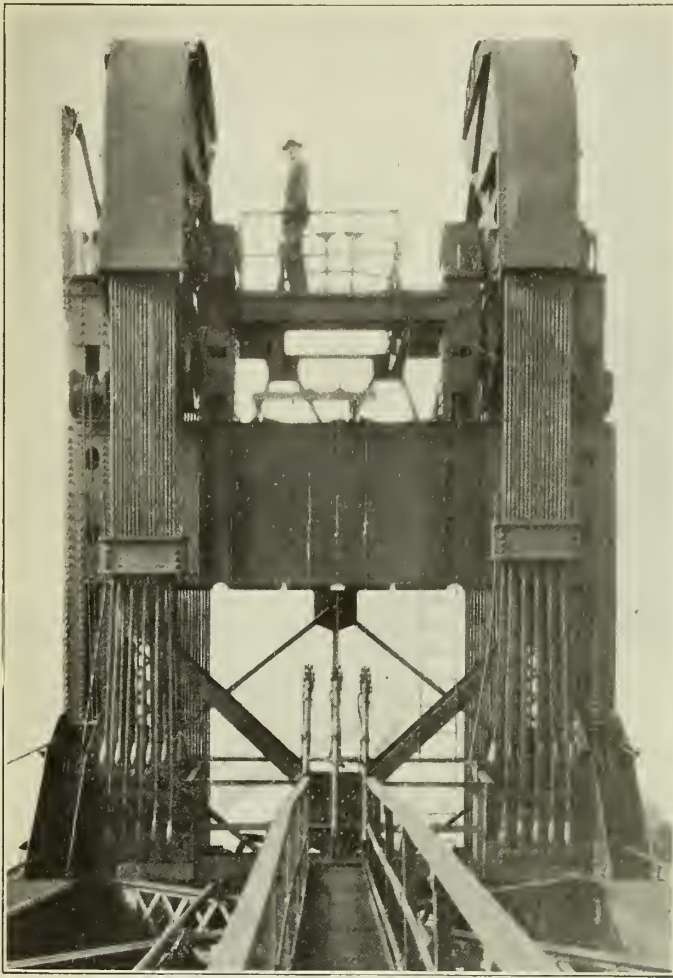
Bridge No. 17—View from Top of Lift Span showing Trolleys, Sheaves, Ropes, etc.
